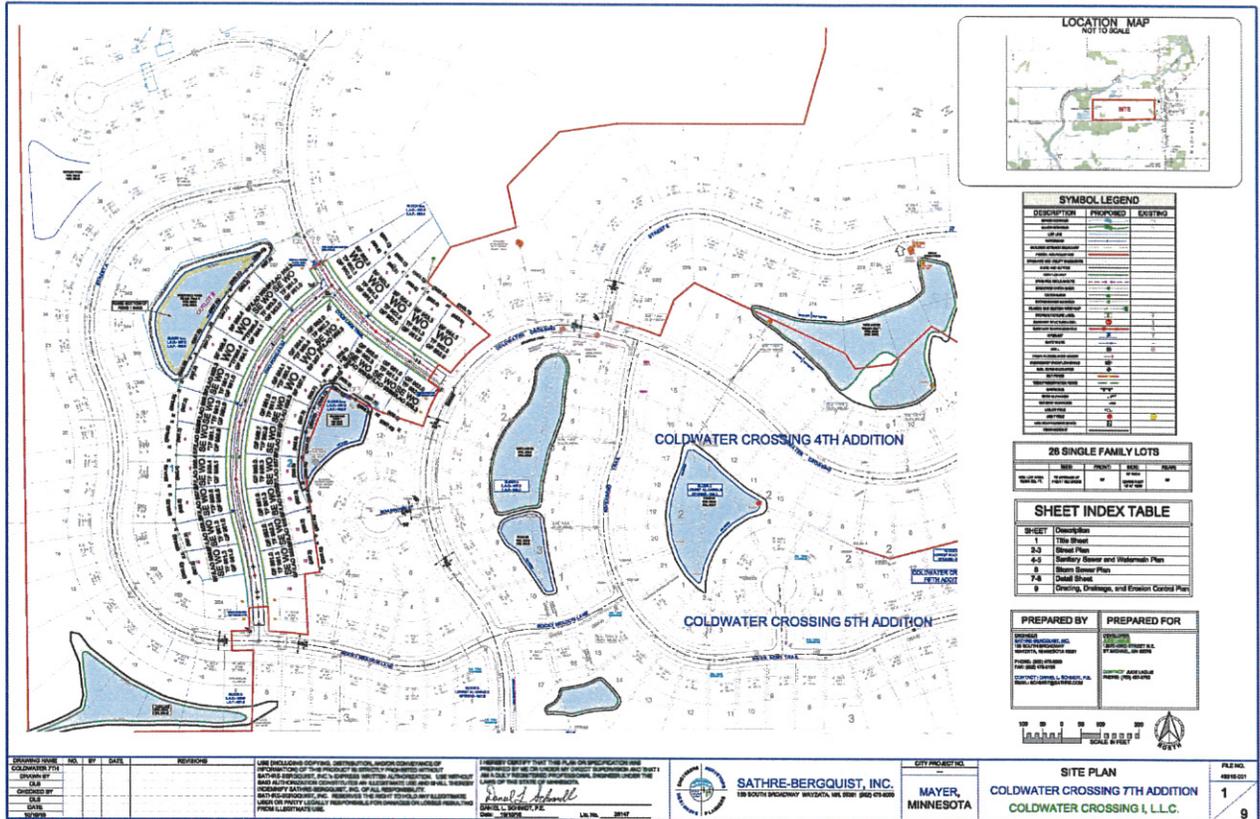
Exhibit C - Site Plan of Coldwater Crossing 7th Addition dated 12-5-16
